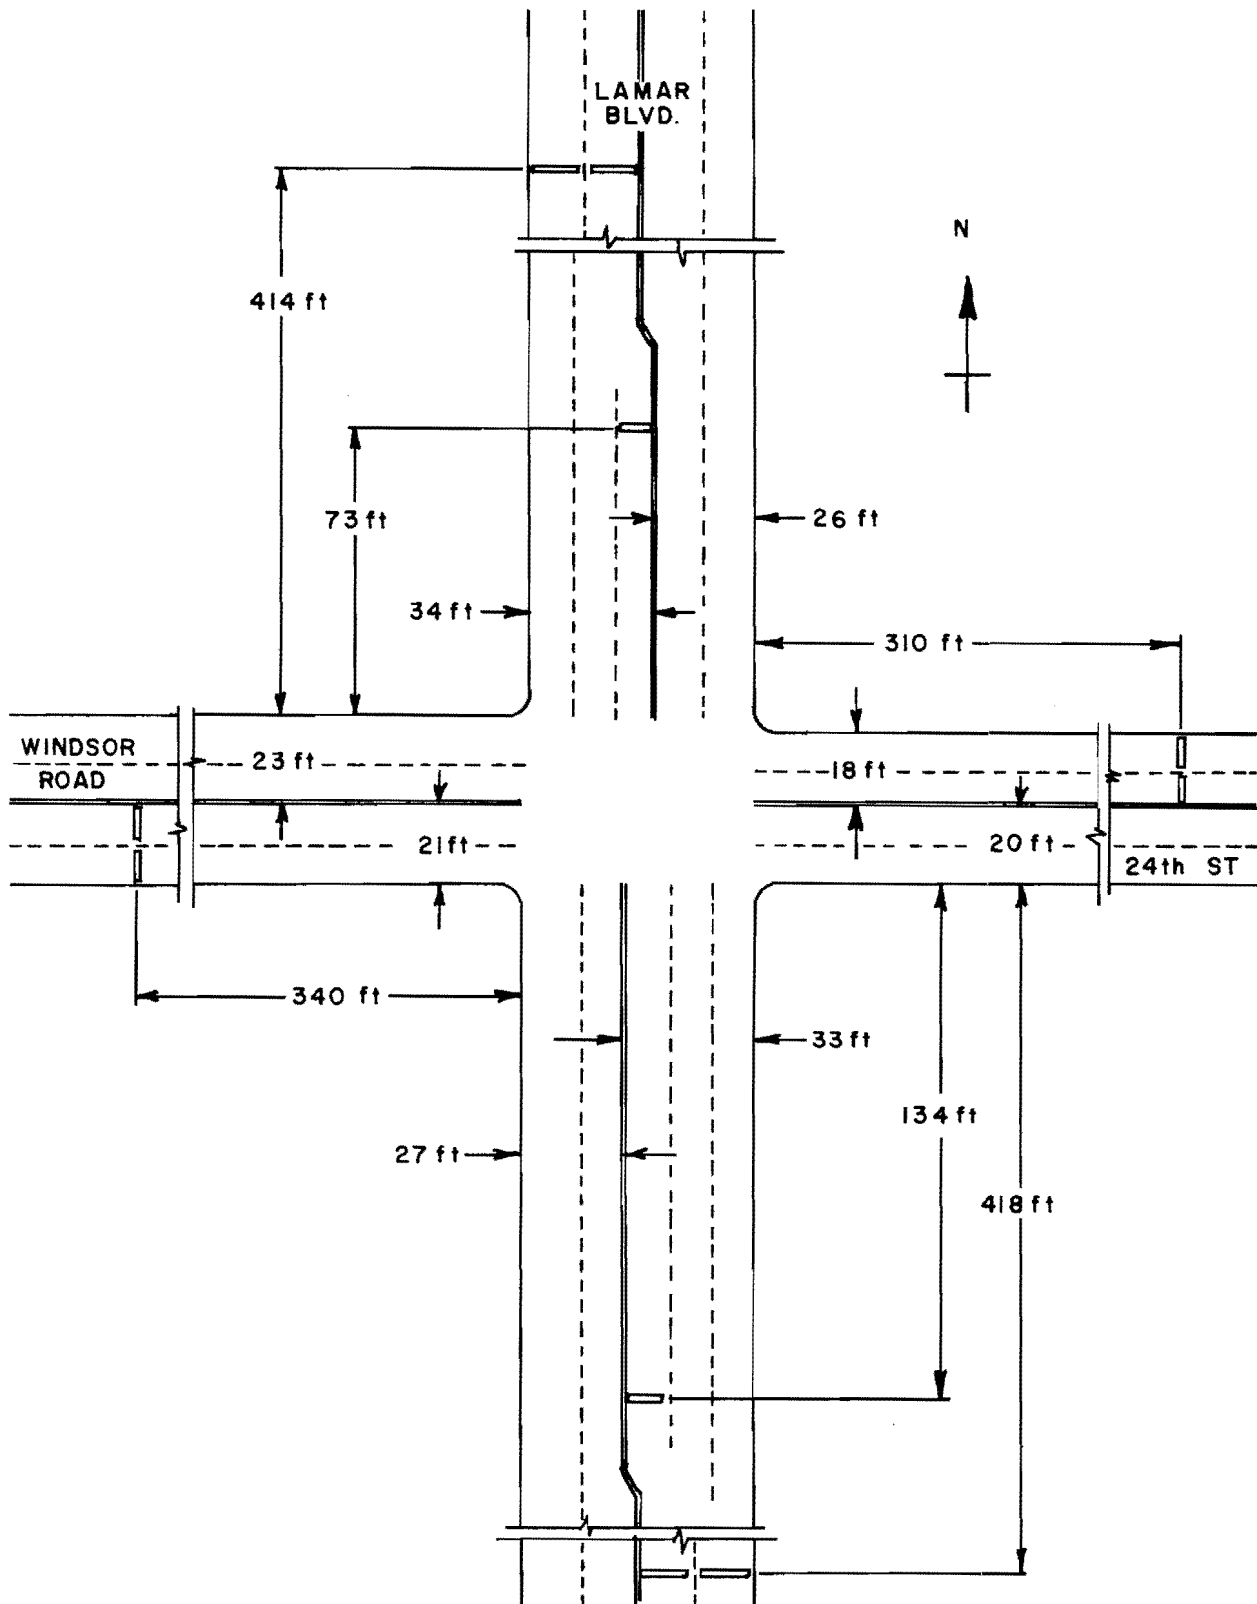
Geometric layout of 24th and Lamar intersection (signalized).
